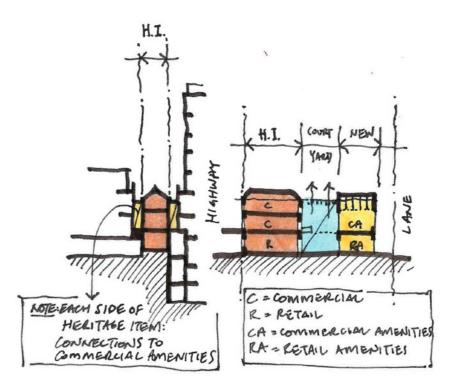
Indicative layout plans and sketch concept showing the proposed integration of retained heritage item into the overall podium design (source: PTW).
